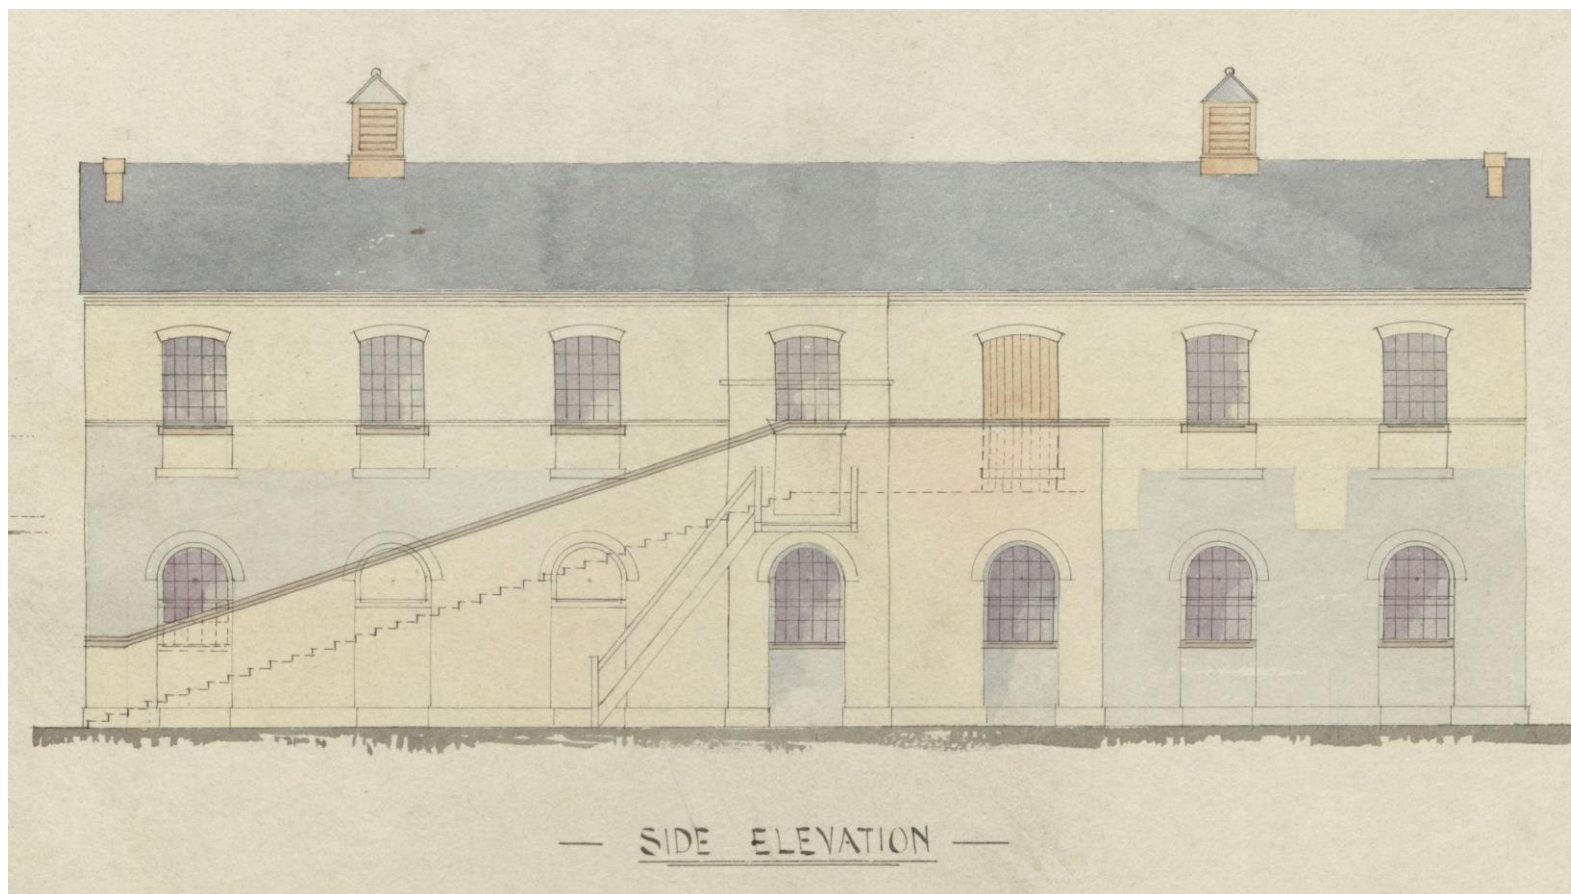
Long Stable South Elevation drawing. Note the horse ramp providing access to the first floor (now lost).
